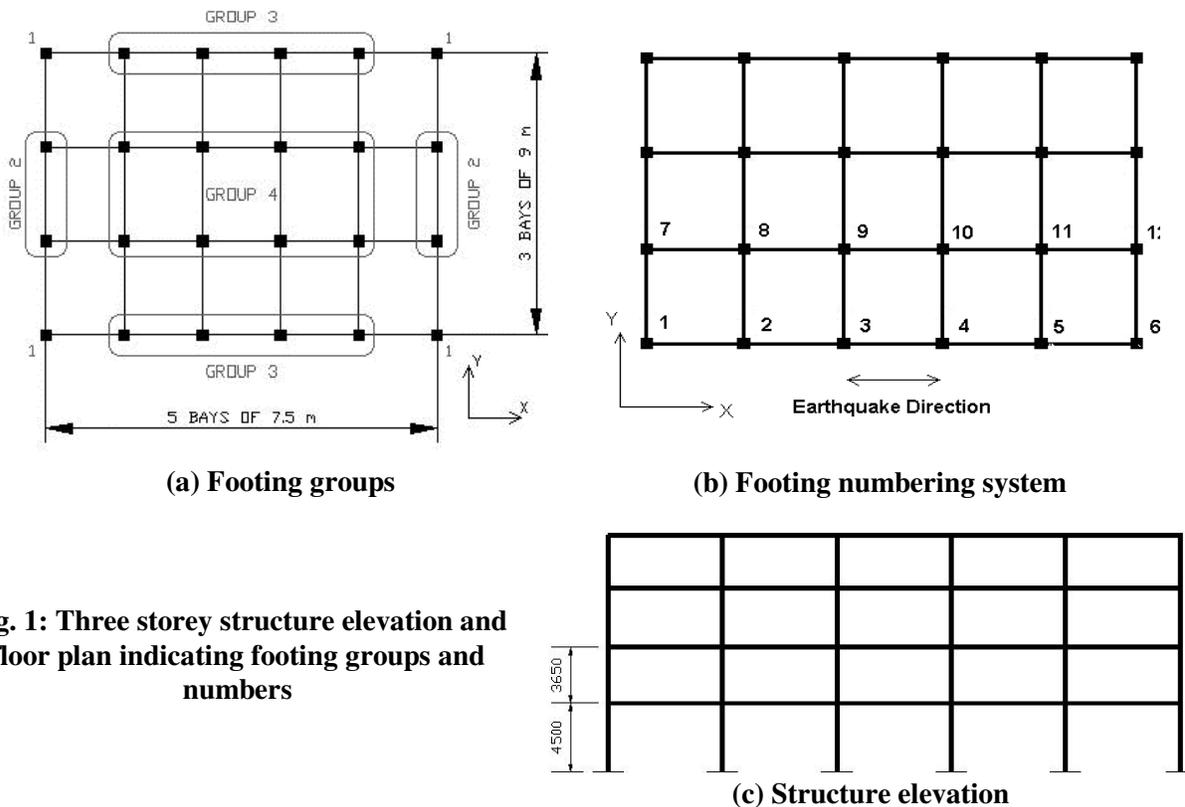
Three storey structure elevation and floor plan indicating footing groups and numbers
